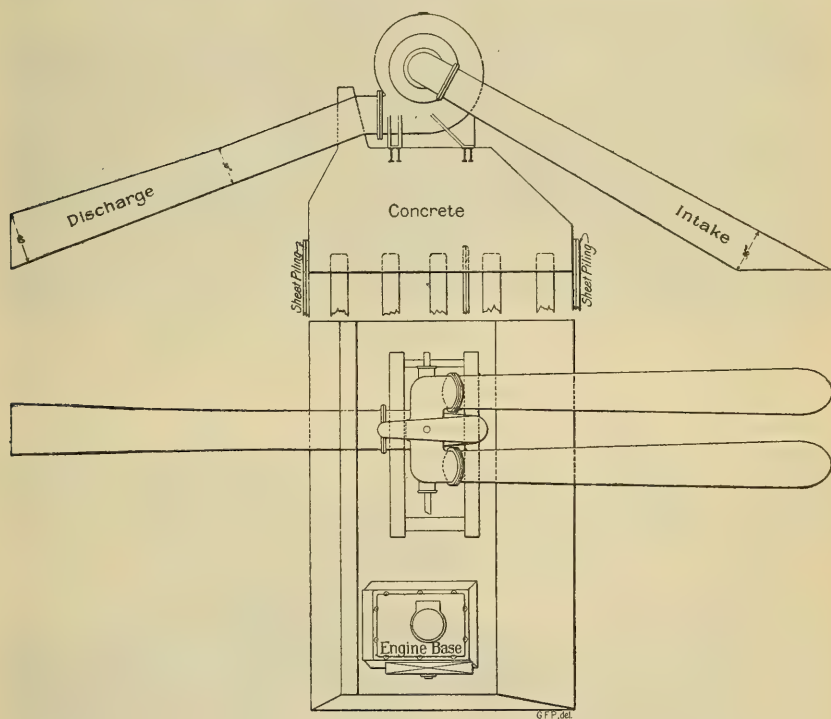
Sketch plan and elevation of one unit in pumping plant of area No. 4, Raceland, La.
